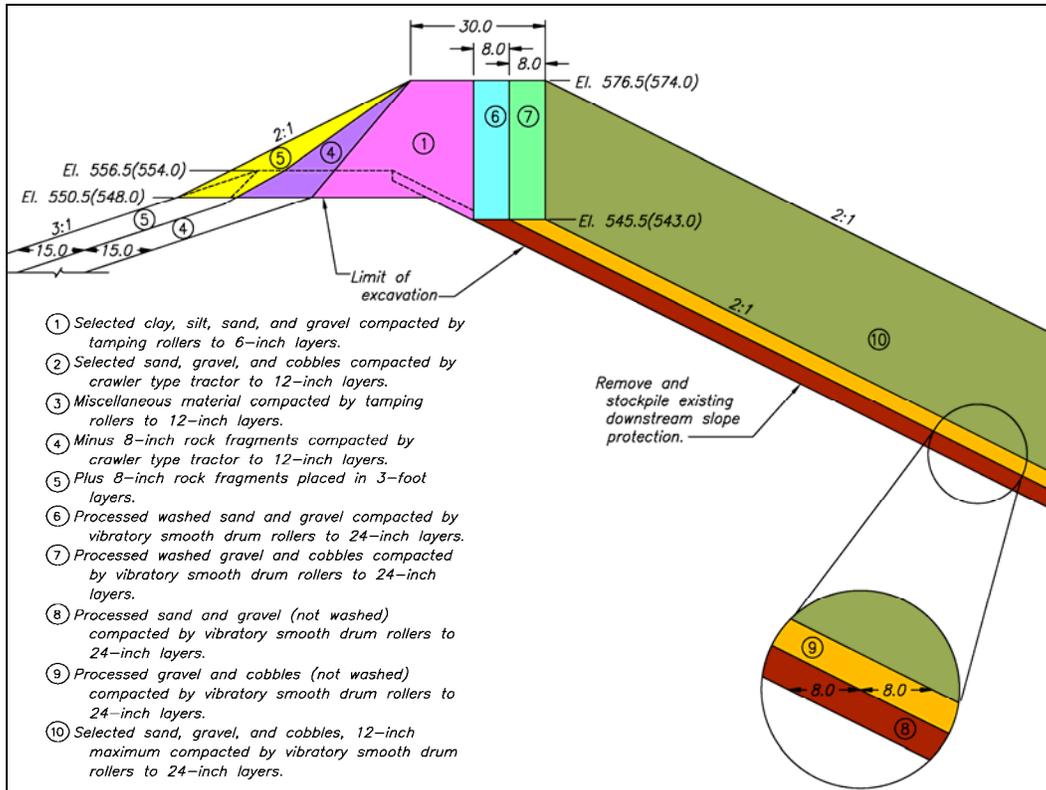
Typical 20-foot dam/dike overlay raise cross-section (abbreviated Figure A10 from [7]).
